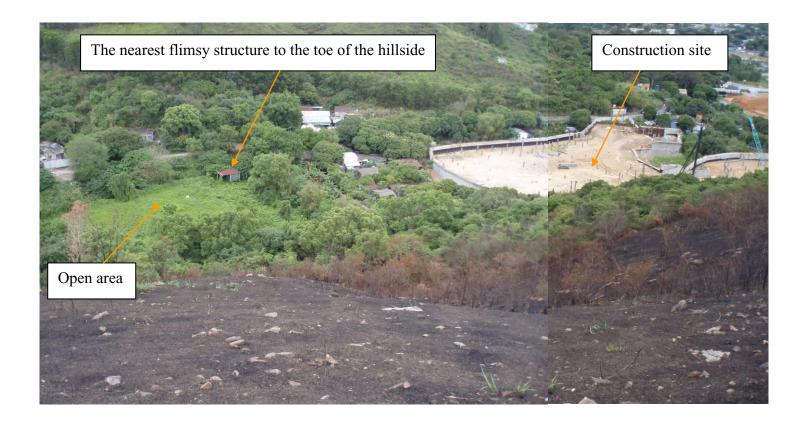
Facilities at the Toe of the North-facing Hillside (Photograph taken on 23 April 2007)
